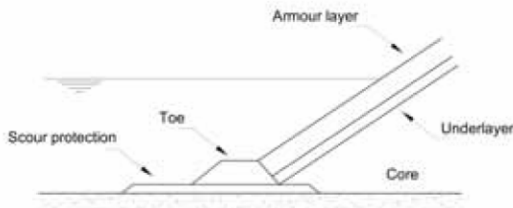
TRADITIONAL TOE CONSTRUCTION
